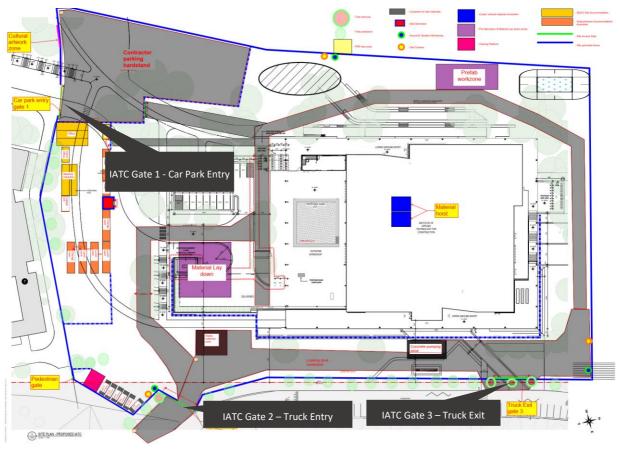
Site Establishment Plan (Source: ADCO)
